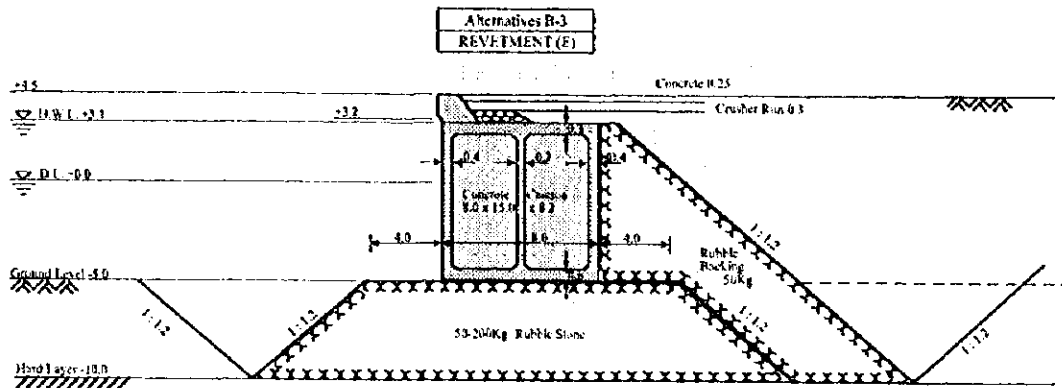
Concrete Caisson Type Revetment (-5m)
